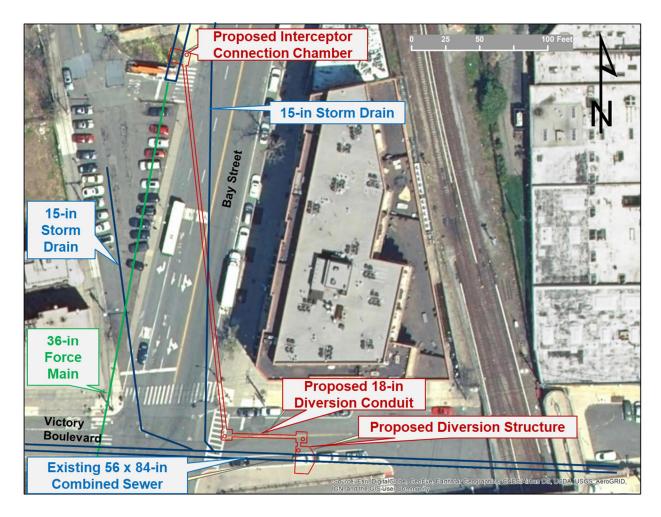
Conceptual Layout of Alternative NYB-2 - Hannah Street Pumping Station Bypass
